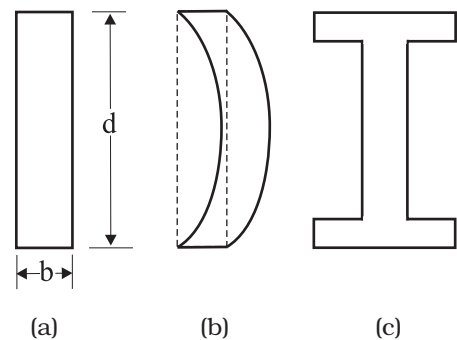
Different cross-sectional shapes of a beam. (a) Rectangular section of a bar; (b) A thin bar and how it can buckle; (c) Commonly used section for a load bearing bar.
